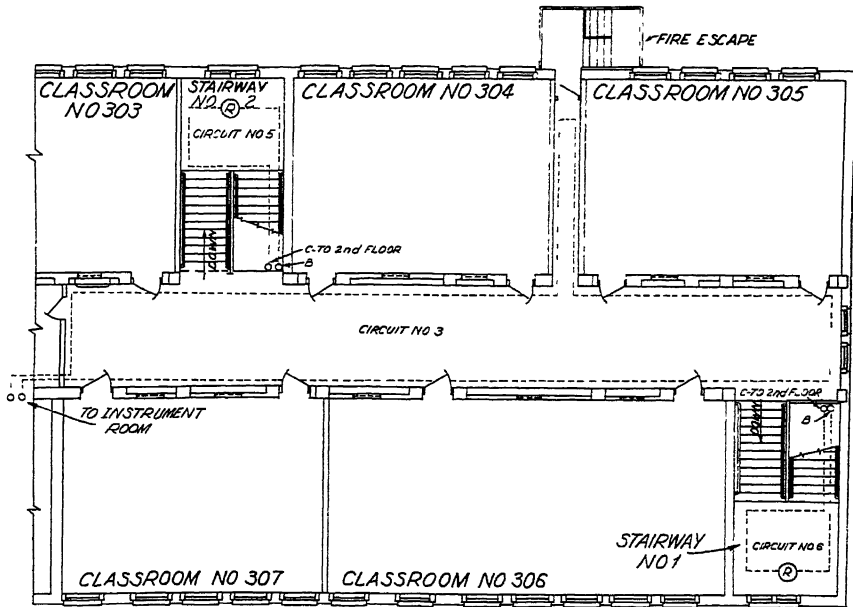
Cont. Third floor plan showing location of pneumatic tubing of rate-of-rise automatic fire detection system.
